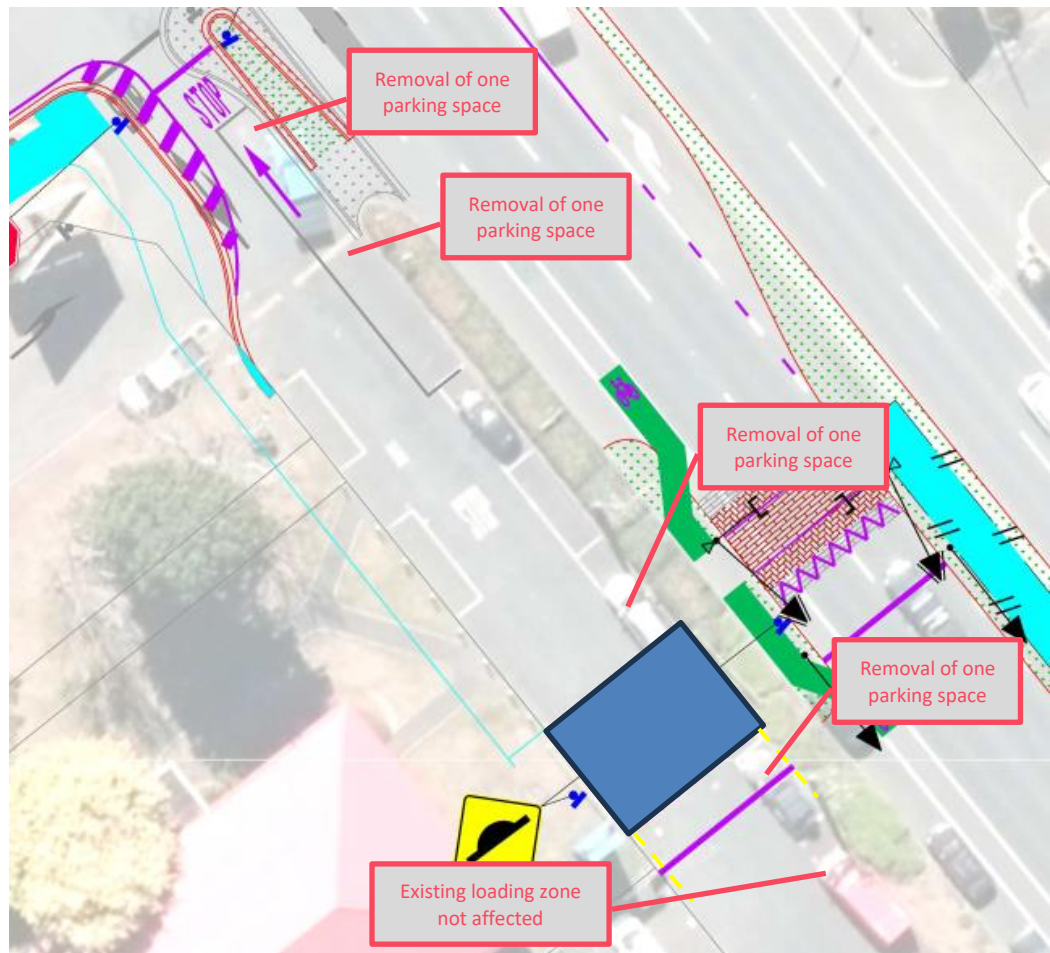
Mr Hall's Proposal – Removal of Parking Spaces on Te Rapa Road Service Lane
